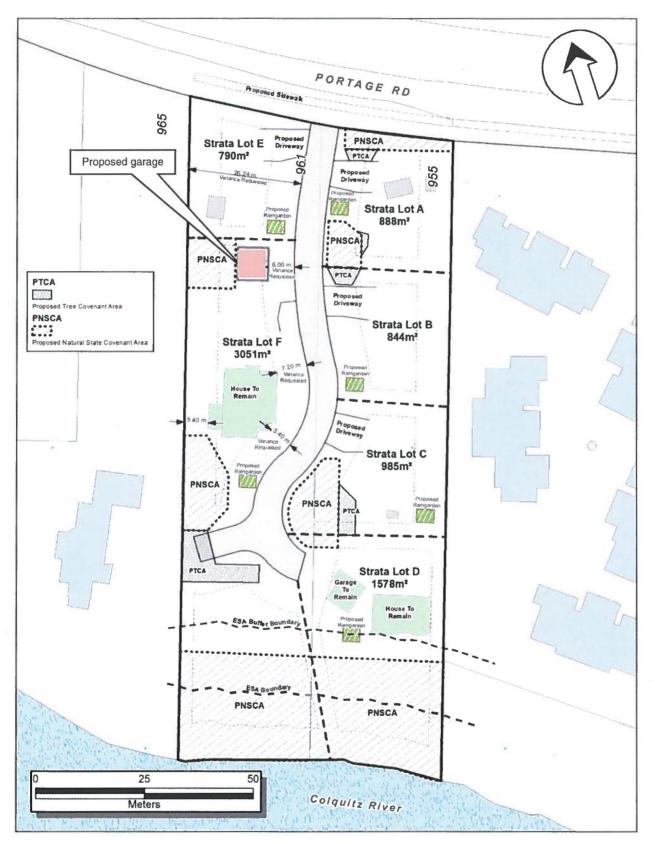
(Revised): Proposed Bare Land Strata Subdivision
